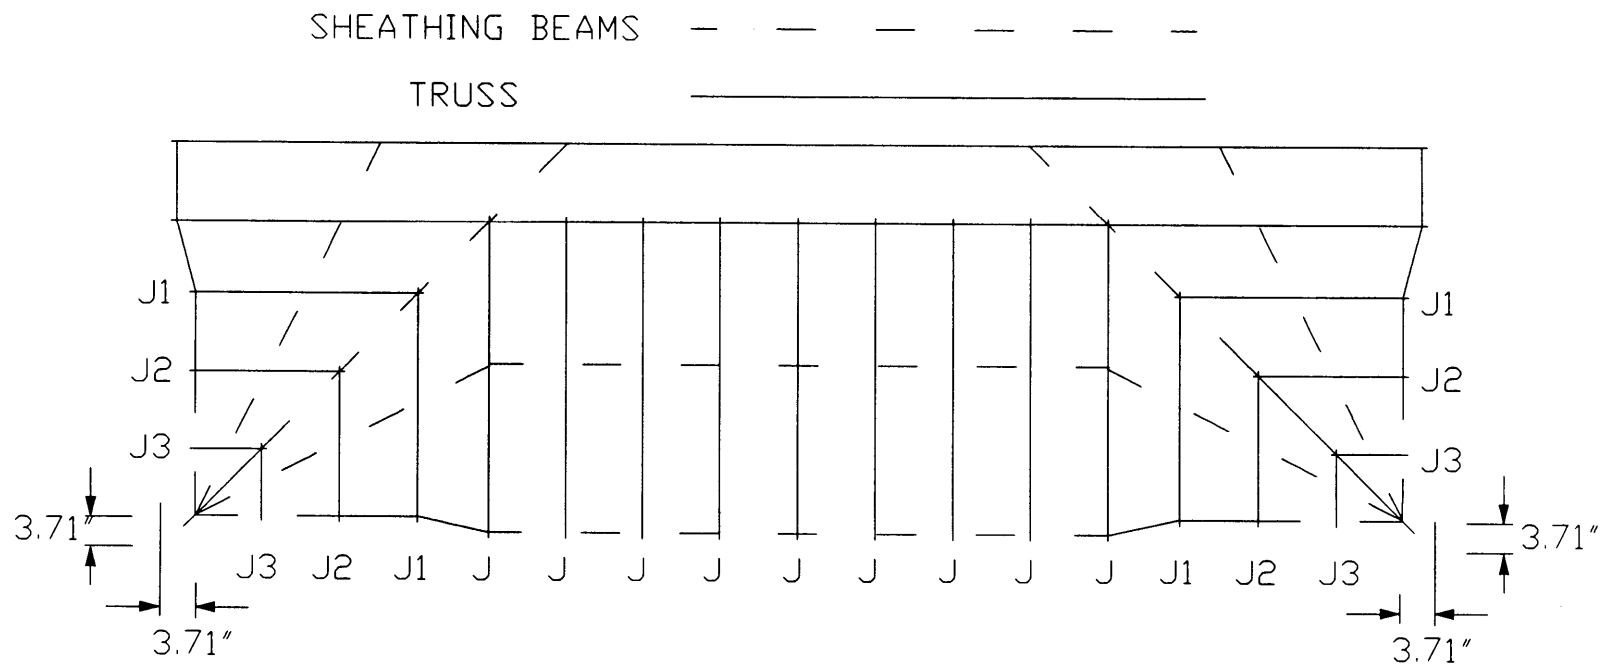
Close-Up of Truss Types J1, J2 and J3
